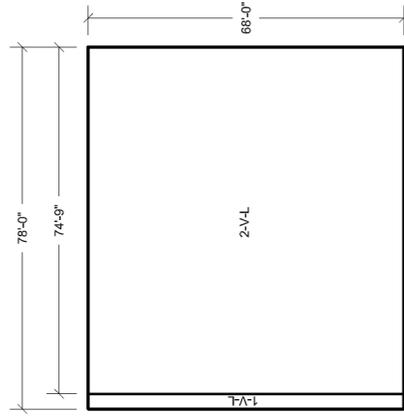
H.6-78: PUMP HOUSE INTERNAL WEST WALL LOOKING WEST
